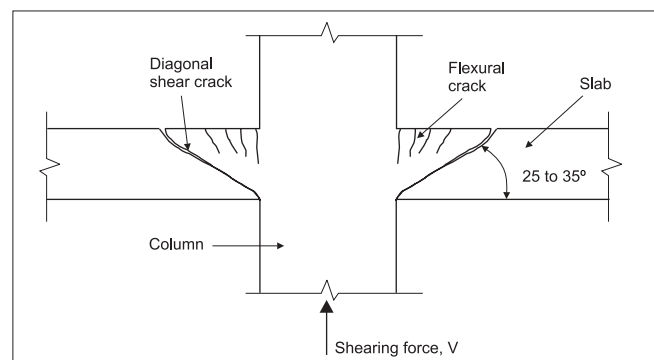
Flexural and shear cracks in the flat slab near the vicinity of column
